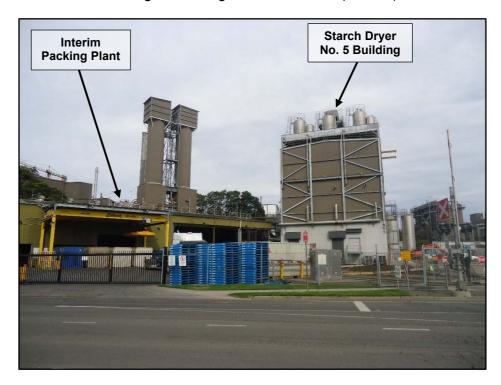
View of Shoalhaven Starches factory site (Starch Dryer No. 5 and Interim Packing Plant building) from Bolong Road.
